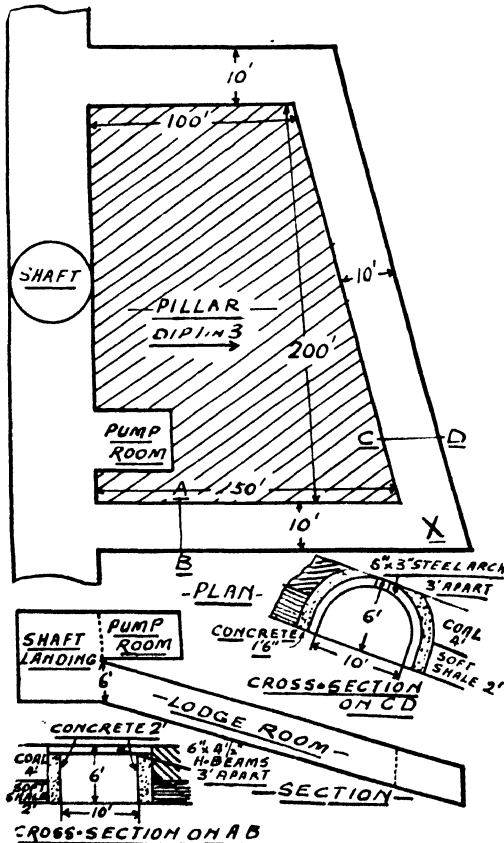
Arrangement of Pump House and Water Lodge Room,
